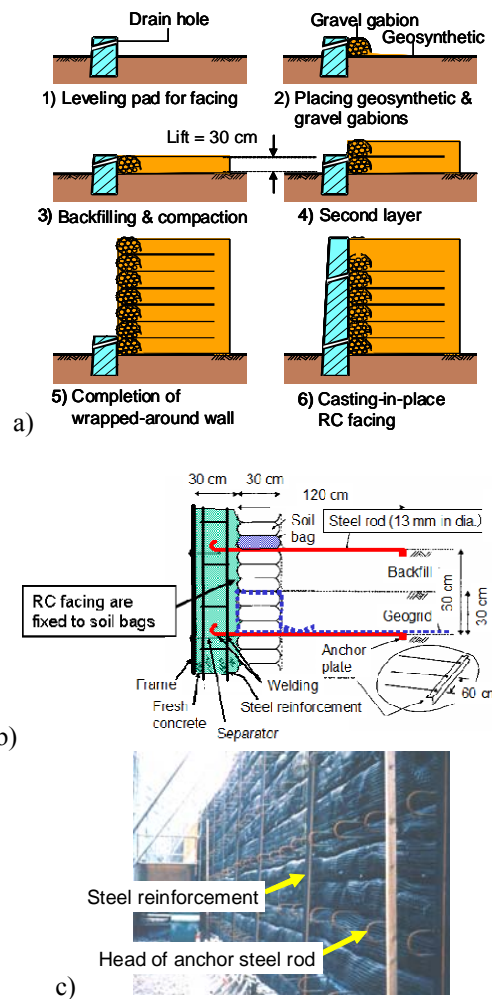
Staged construction of a GRS RW: a) construction steps; b) details of connection between the facing and the reinforced backfill; and c) typical wall face before casting-in-place fresh concrete for FHR facing (Tatsuoka et al., 1997, 2007).
